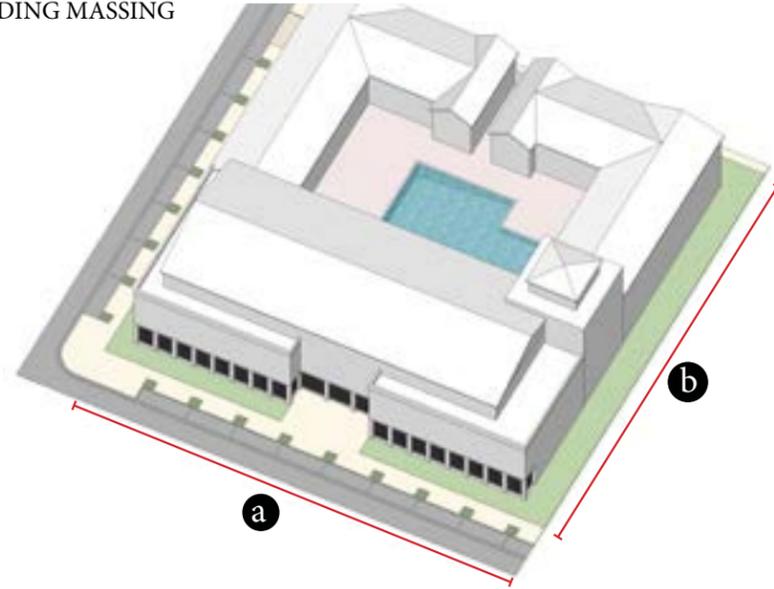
COURTYARD BUILDING TYPE B
